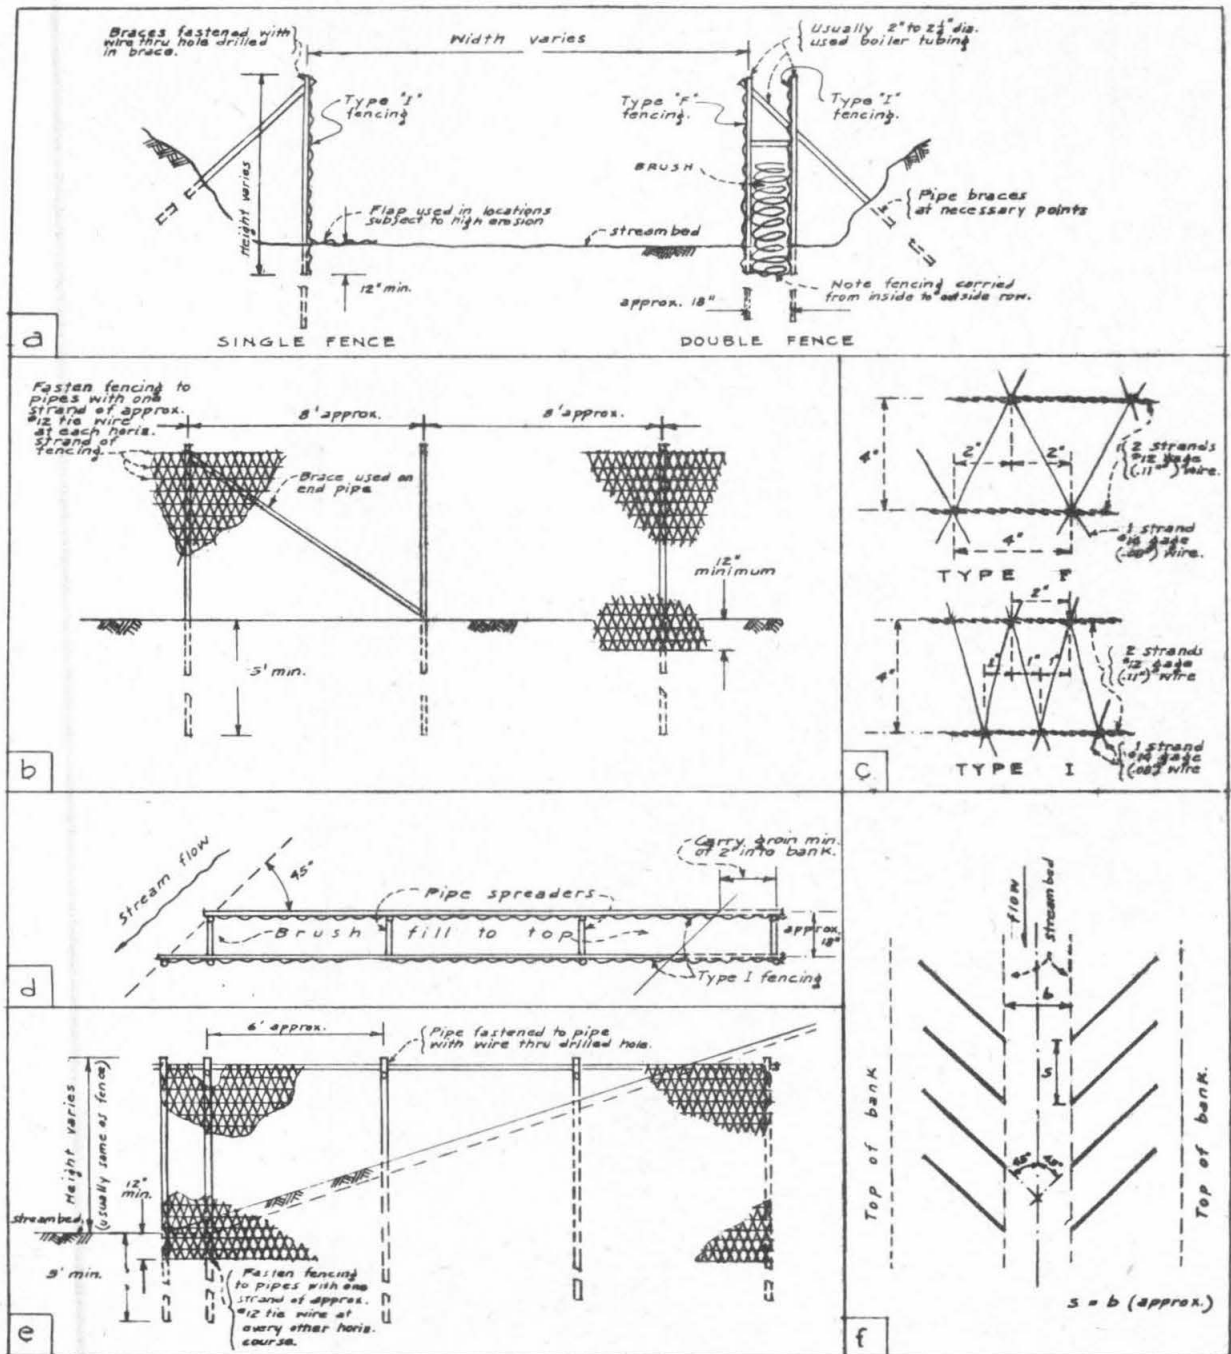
PIPE AND WIRE FENCE AND GROIN CONSTRUCTION DETAILS
